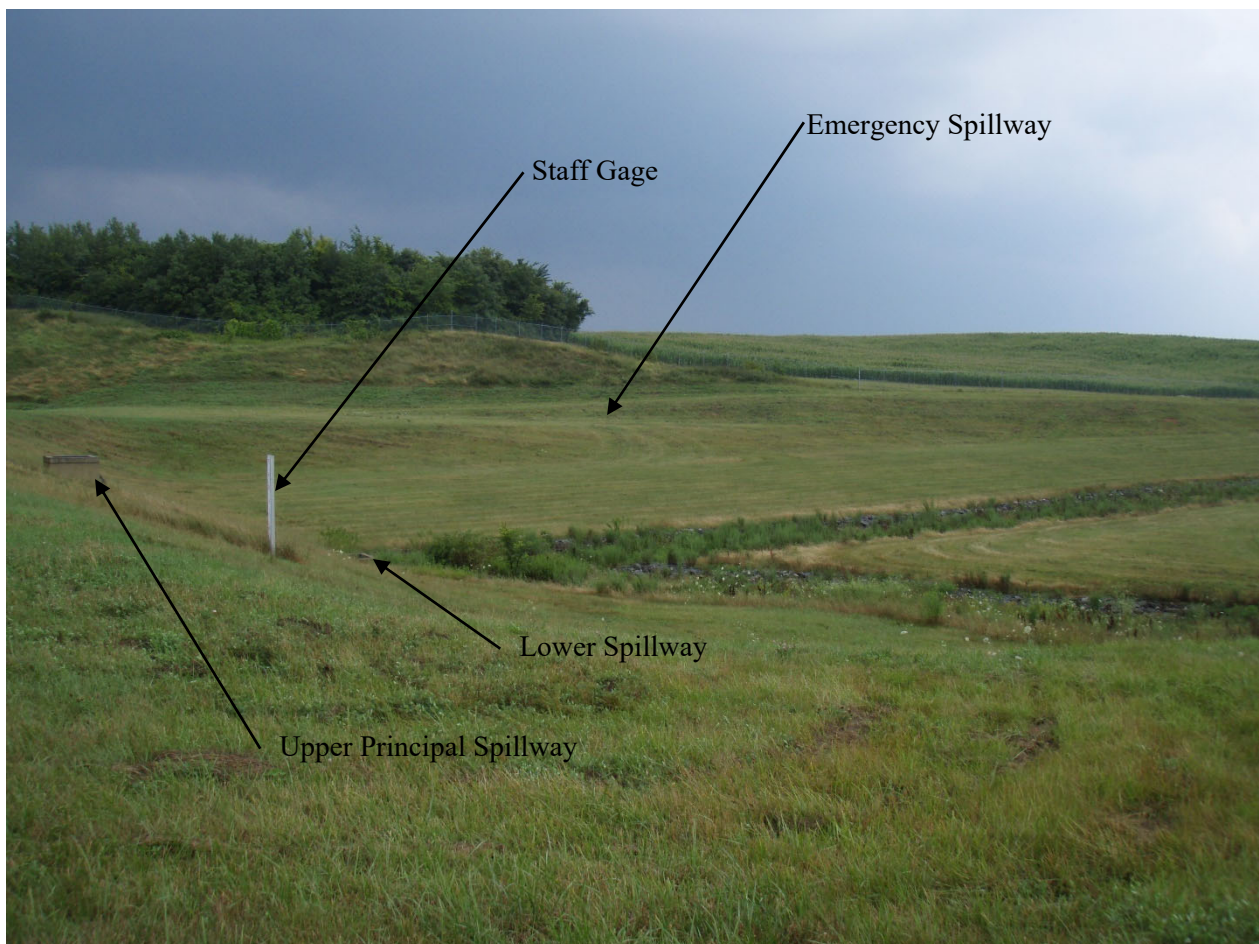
Photograph Showing Staff Gage, Emergency Spillway, and Principal Spillway Looking South from Gate
